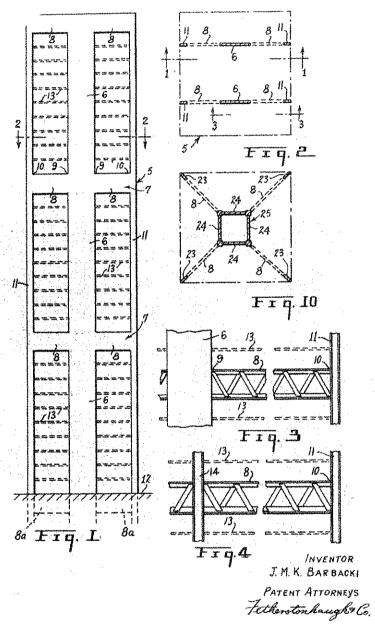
Jacek M. K. Barbacki, Wind and Frame Earthquacke T-Frame system for building", drawing Lapatent n. 659142, CIPO. (Photo available on: cipo.gc.ca)
